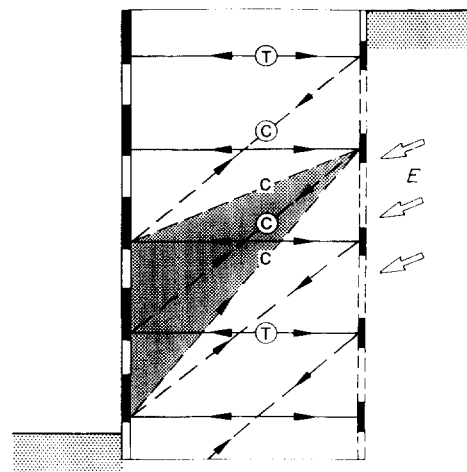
Idealization of soil (fill material) and structural members of a loop anchor wall system as a truss like retaining structure.
